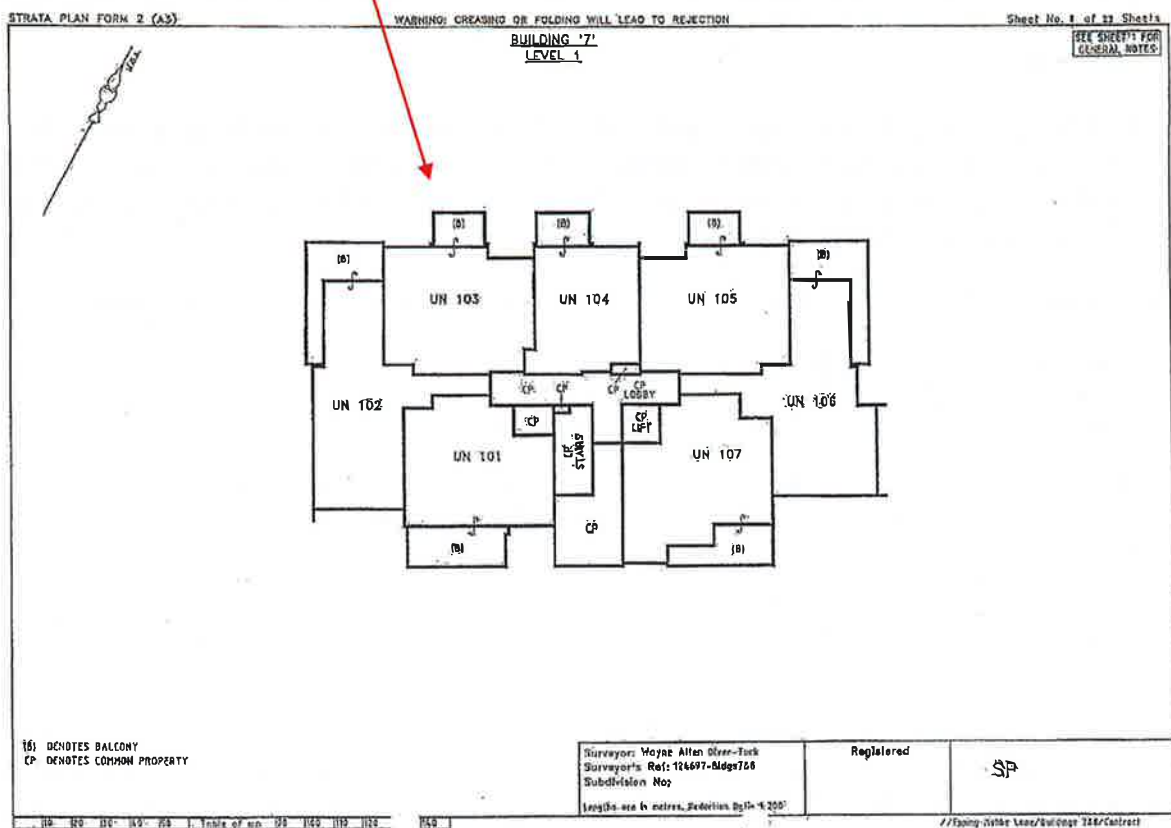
Proposed strata plan of Building 7 level 1 (part)
